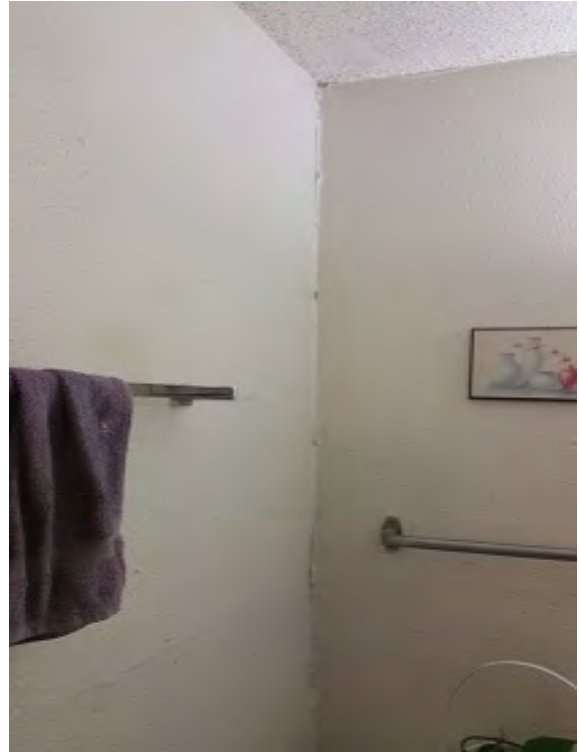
Unit 131: Crack in NE Corner of Bedroom
